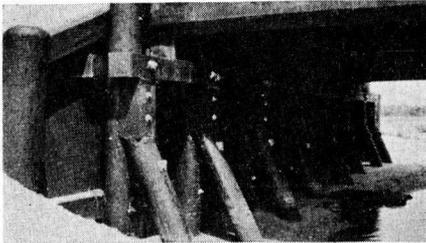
Batter Pile Braced Timber Sheeting. Courtesy of Amer. Wood Preservers Assn.
